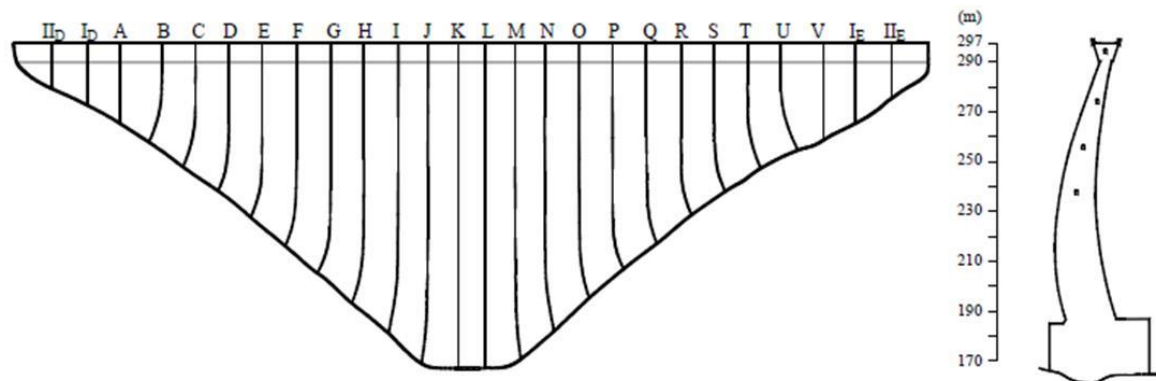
Cabril Dam downstream elevation and cross-section of the central cantilever
